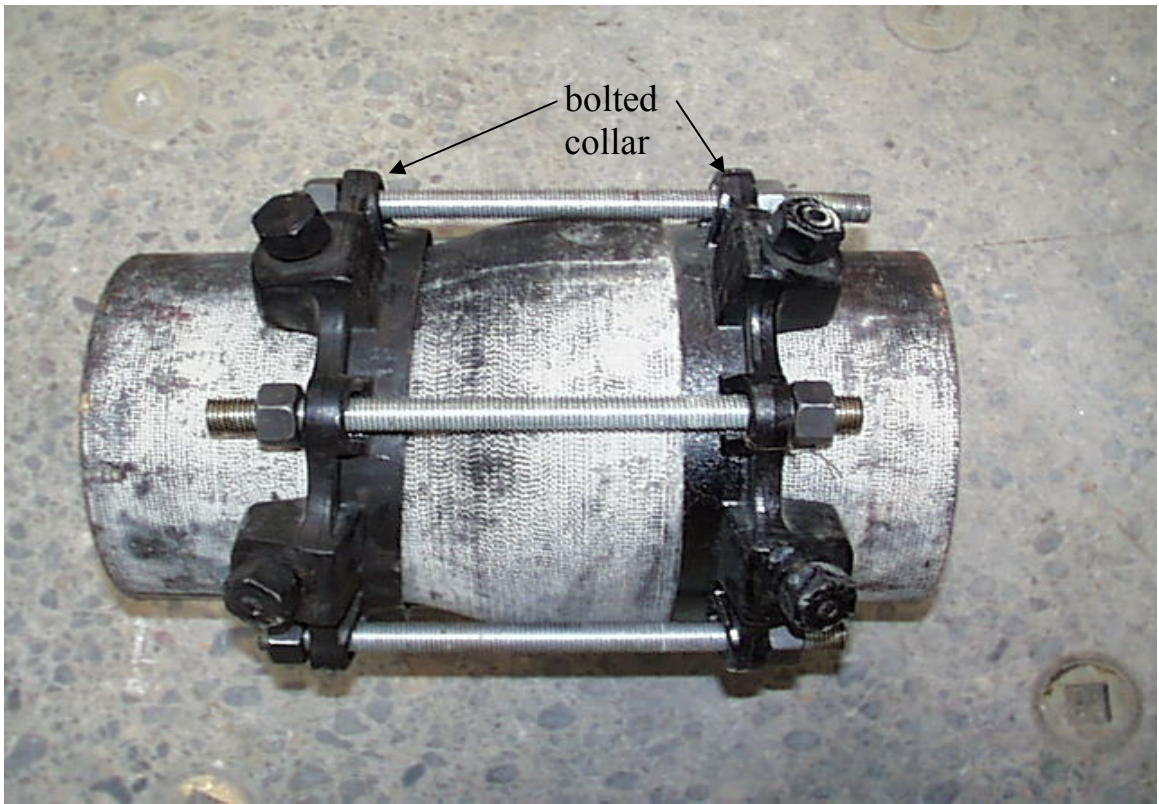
Ductile Iron Pipe with Bolted Collar Joint
